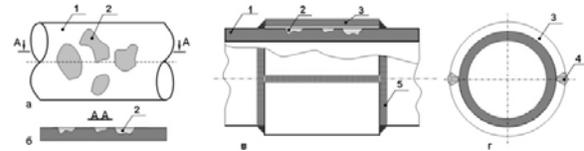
Repair of a damaged zone of a pipeline using sleeves. 1-pipeline; 2-corrosion damage; 3- semicylinders of sleeve; 4- welding joints connecting semicylinders with each other; 5- welding joints connecting ends of the sleeve to the pipeline.
